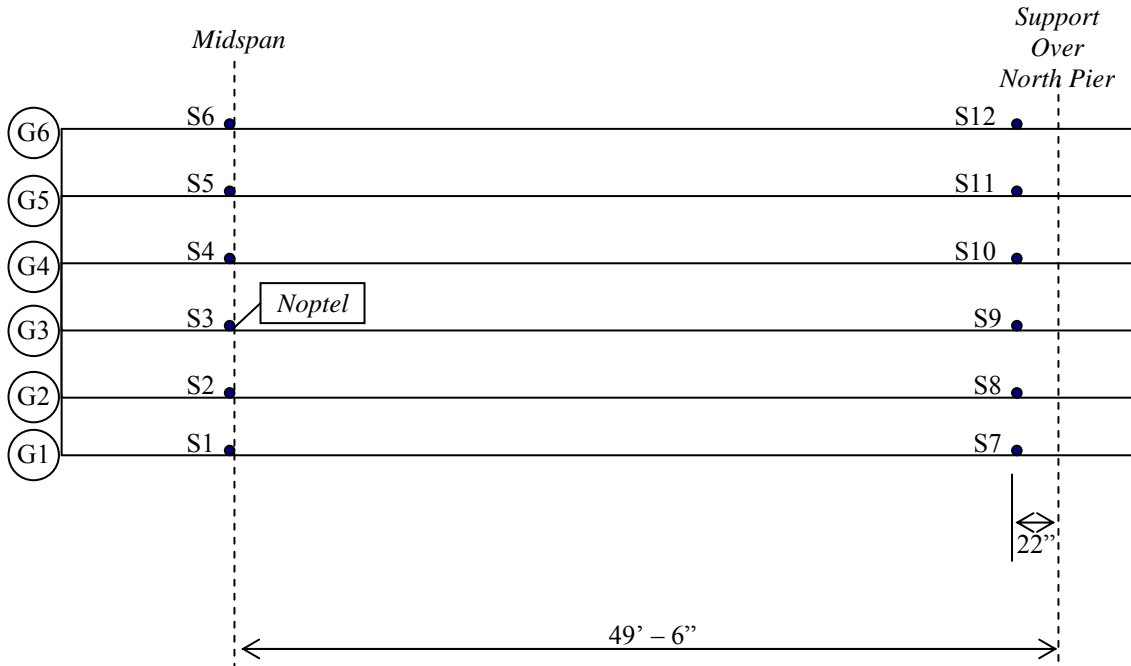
Strain Gage Location in Center Span of Bridge (S08-77024)
